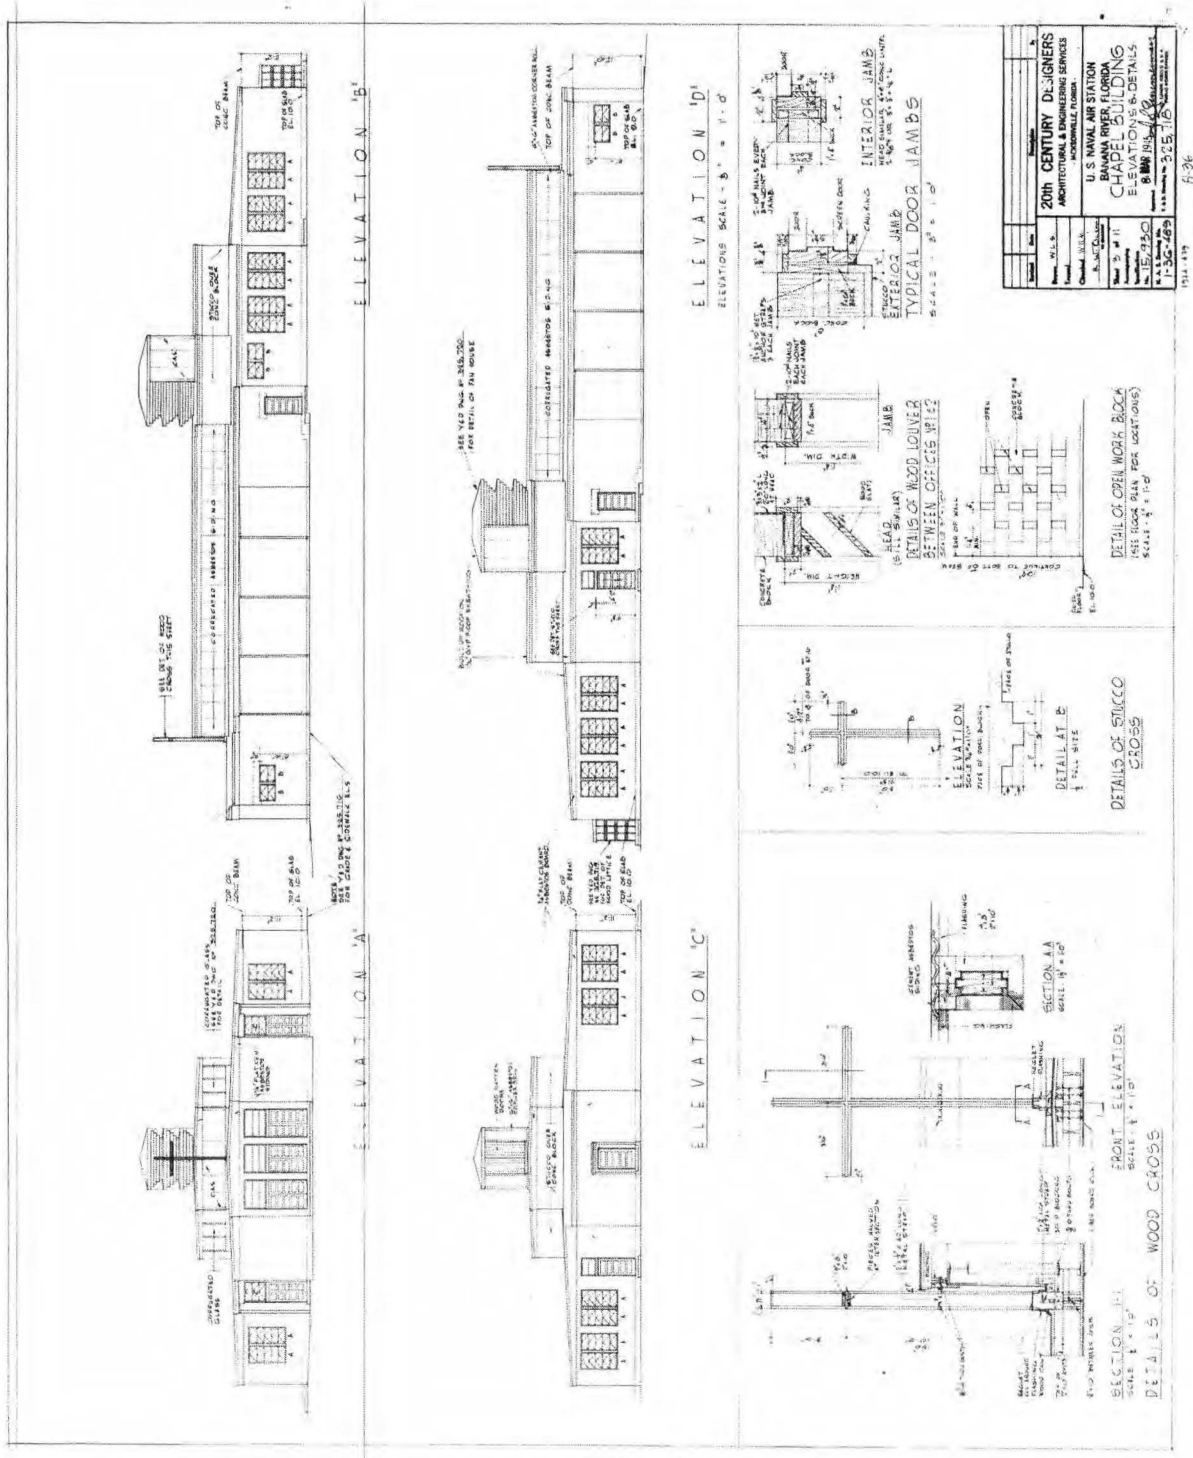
Elevations and Details, Chapel Building, U.S. Naval Air Station Banana River, Florida, 8 March 1945.
